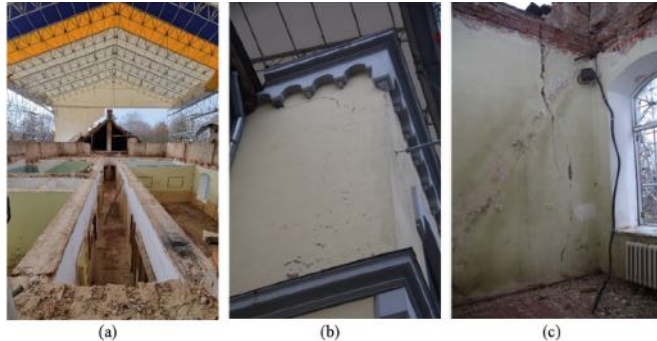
Main types of damage: (a) complete loss of roof and slabs; (b) out-of-plane deviation of the longitudinal façades; (c) structural cracks at the intersection between orthogonal walls.
